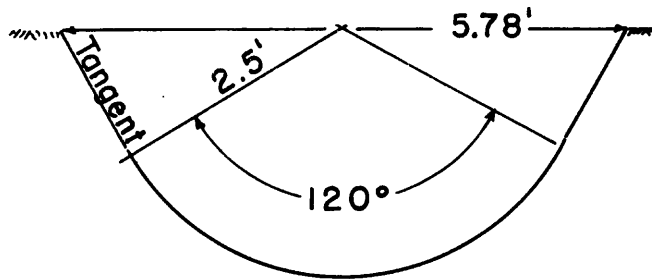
Section of gunite canal lining with reinforcing, Hidalgo County Water Control & Improvement District No. 1
